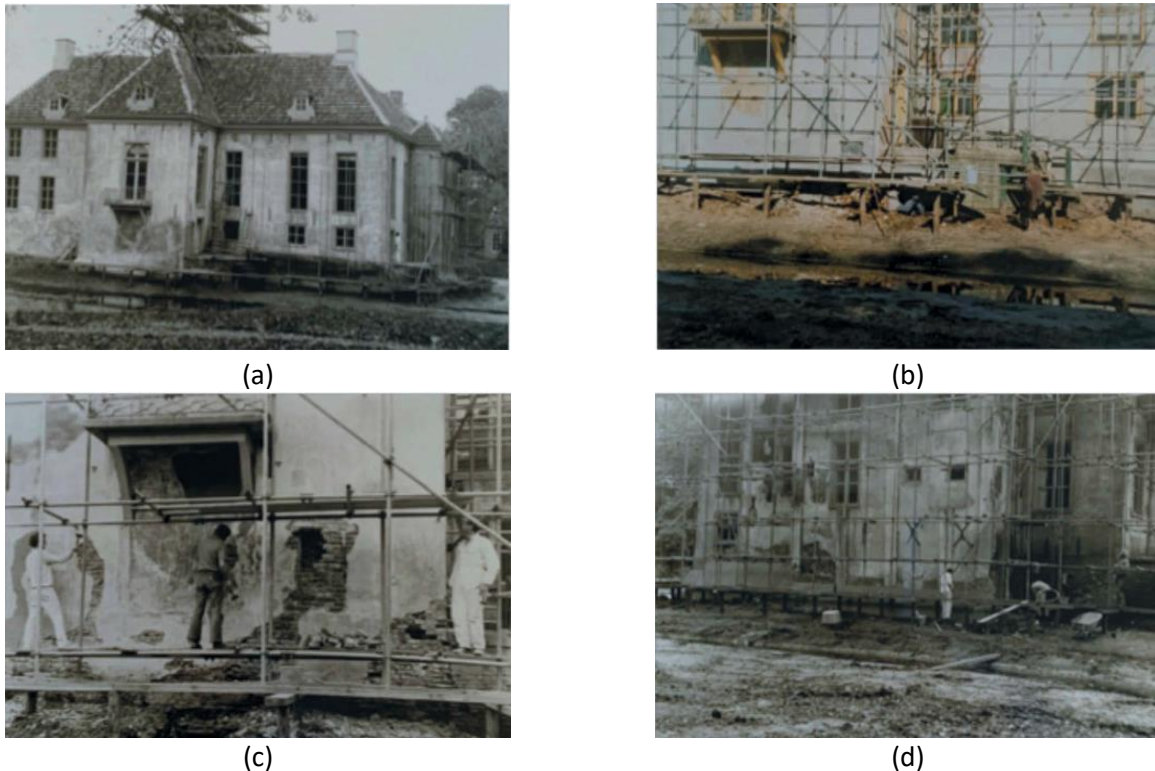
Photographs from the restoration works in 1973, (a) a general view from the building under restoration, (b) works at foundations along the perimeter, (c) mason works on the brick walls, and (d) works on the walls and the foundations.
